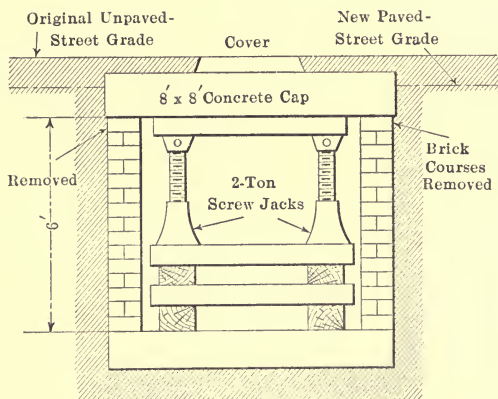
ADAPTING MANHOLE IN NEW STREET GRADE, MILWAUKEE.
